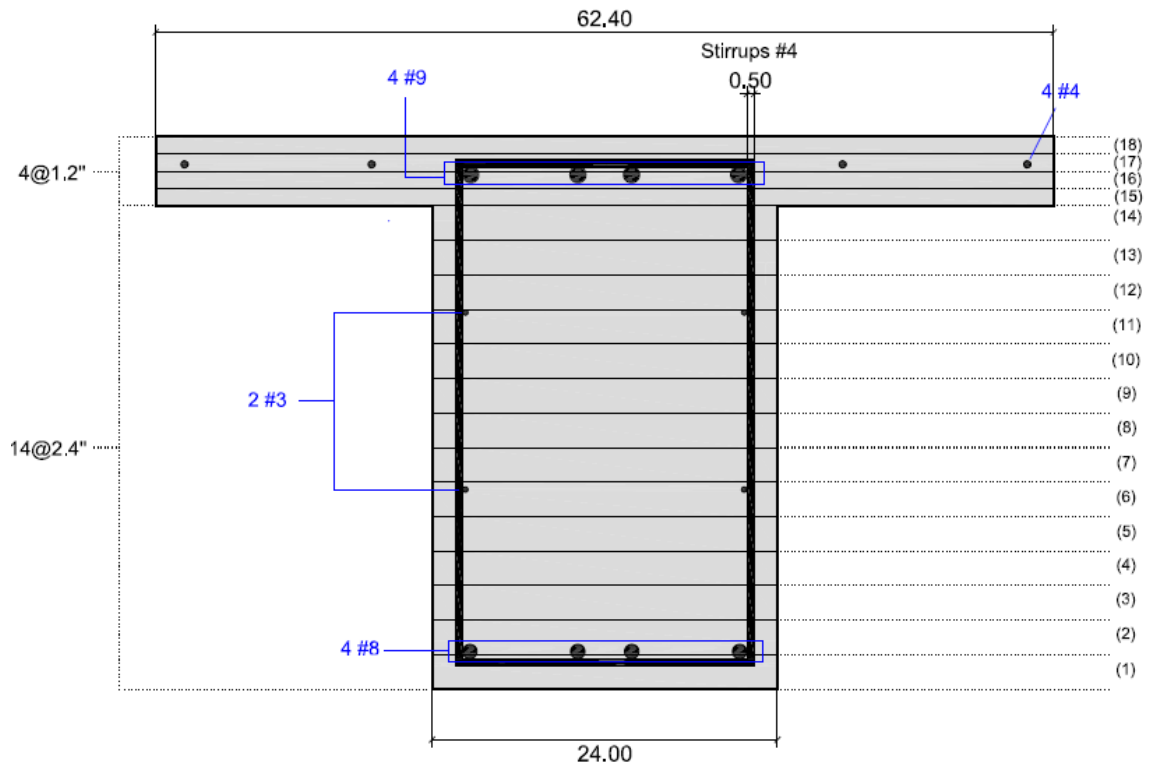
Cross section 2 for Specimen 7. Dimensions in inches.
